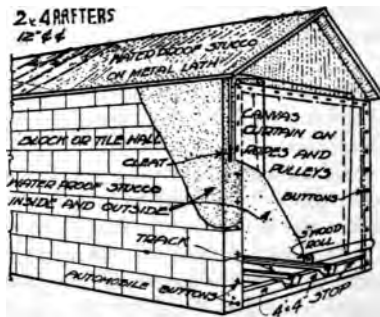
SKETCH SHOWING CONSTRUCTION FOR USE OF ROLLING CANVAS CURTAINS AT INNER END OF STEAM ROOM
